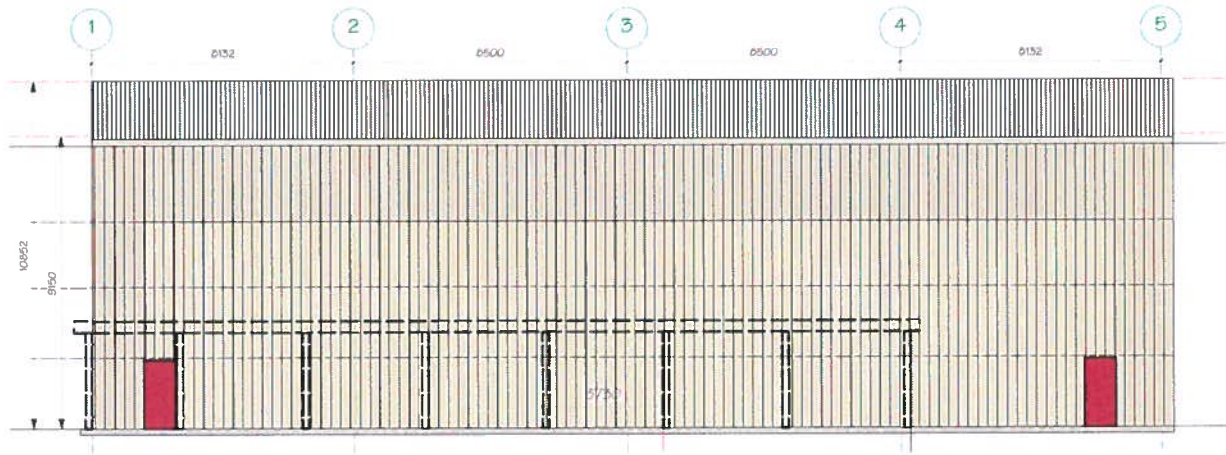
East Elevation (from plans by Praxis Architects Inc.)
